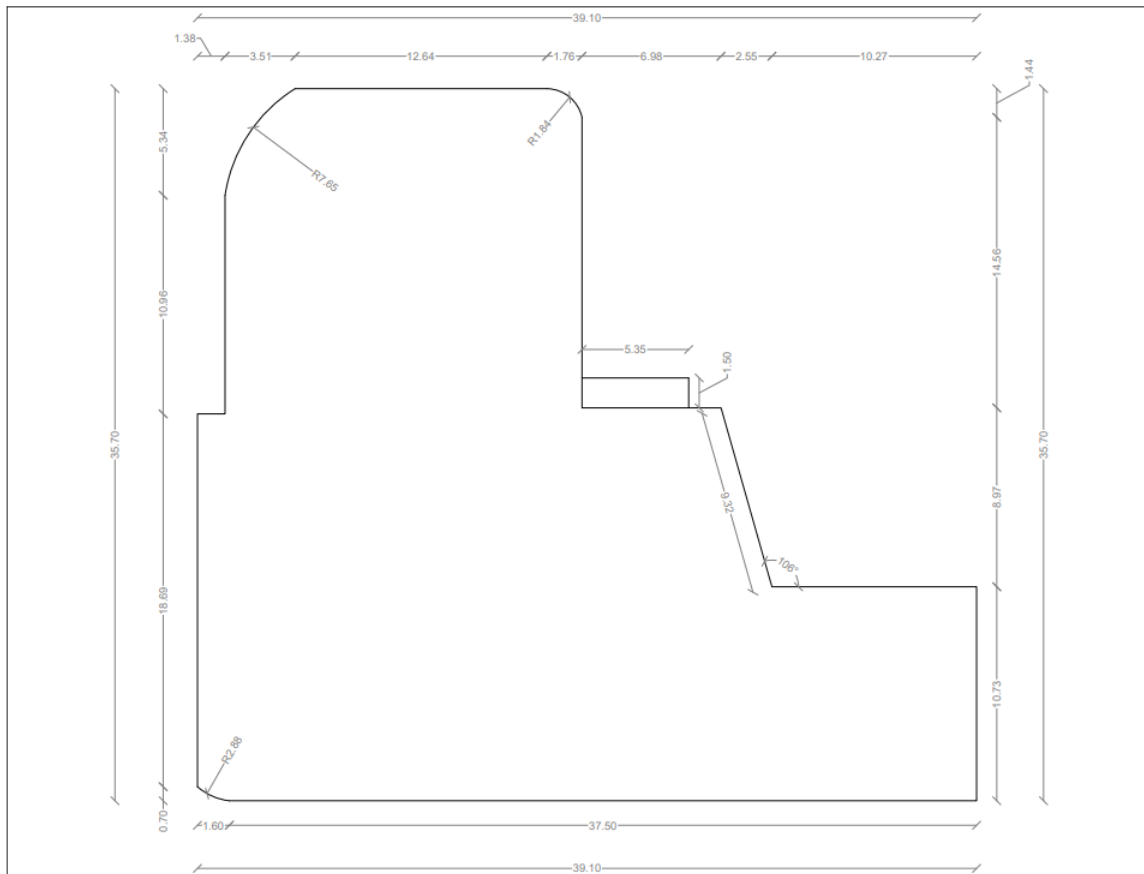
General outline of Al-Tajamo' Commercial Building.
